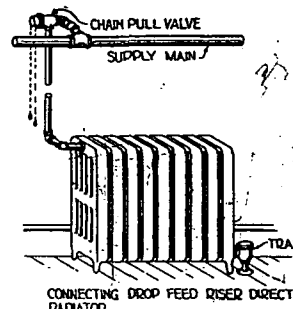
CONNECTING DROP FEED RISER DIRECT TO RADIATOR BY TURNING VALVE ON ITS SIDE
